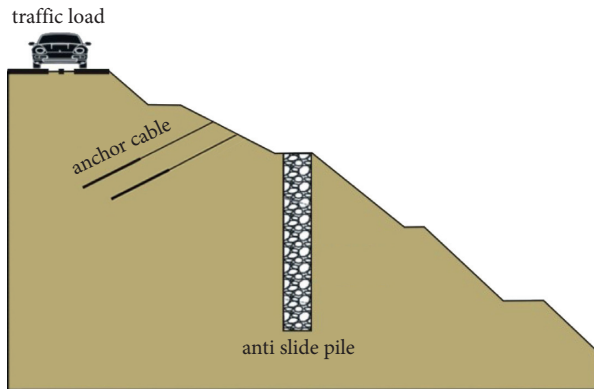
Schematic diagram of slope reinforcement with adjacent pile anchor composite structure.
